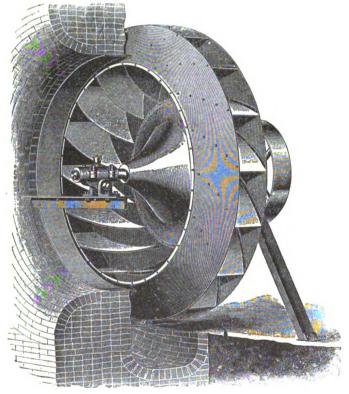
"Cone" Fan. Discharges through Opening in Wall into a "Plenum Chamber" Connecting with Distributing Ducts.
